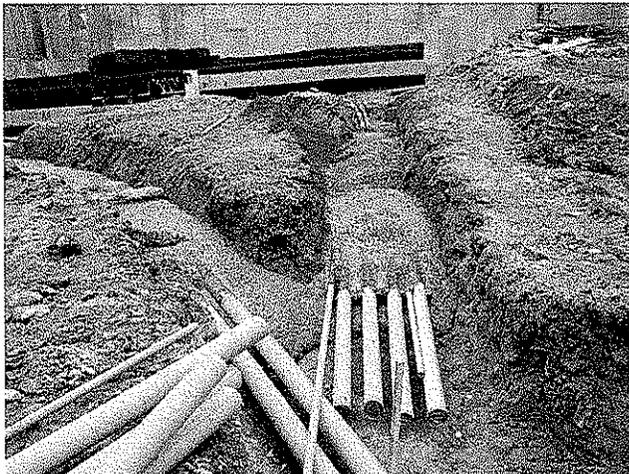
Conduit installation started north of the building segment C basement. September 10, 2010.
